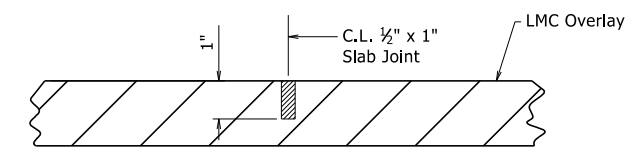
DETAILS OF HYDRODEMOLITION AND LATEX MODIFIED CONCRETE OVERLAY
